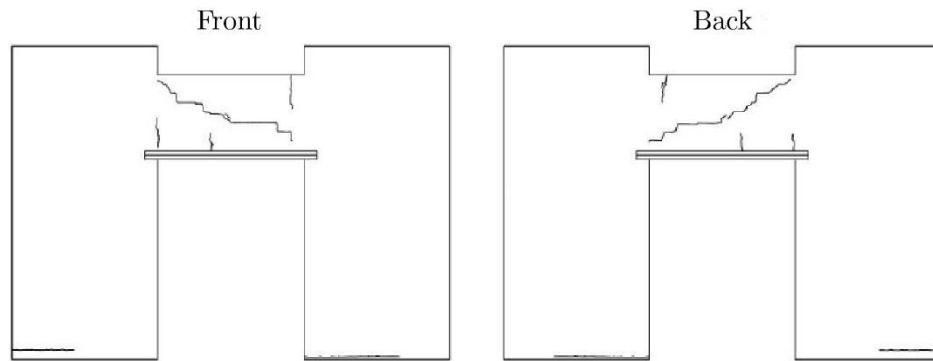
Experimental evidence of in-plane loaded masonry wall: damage patterns after the test (Augenti et al. 2011)
